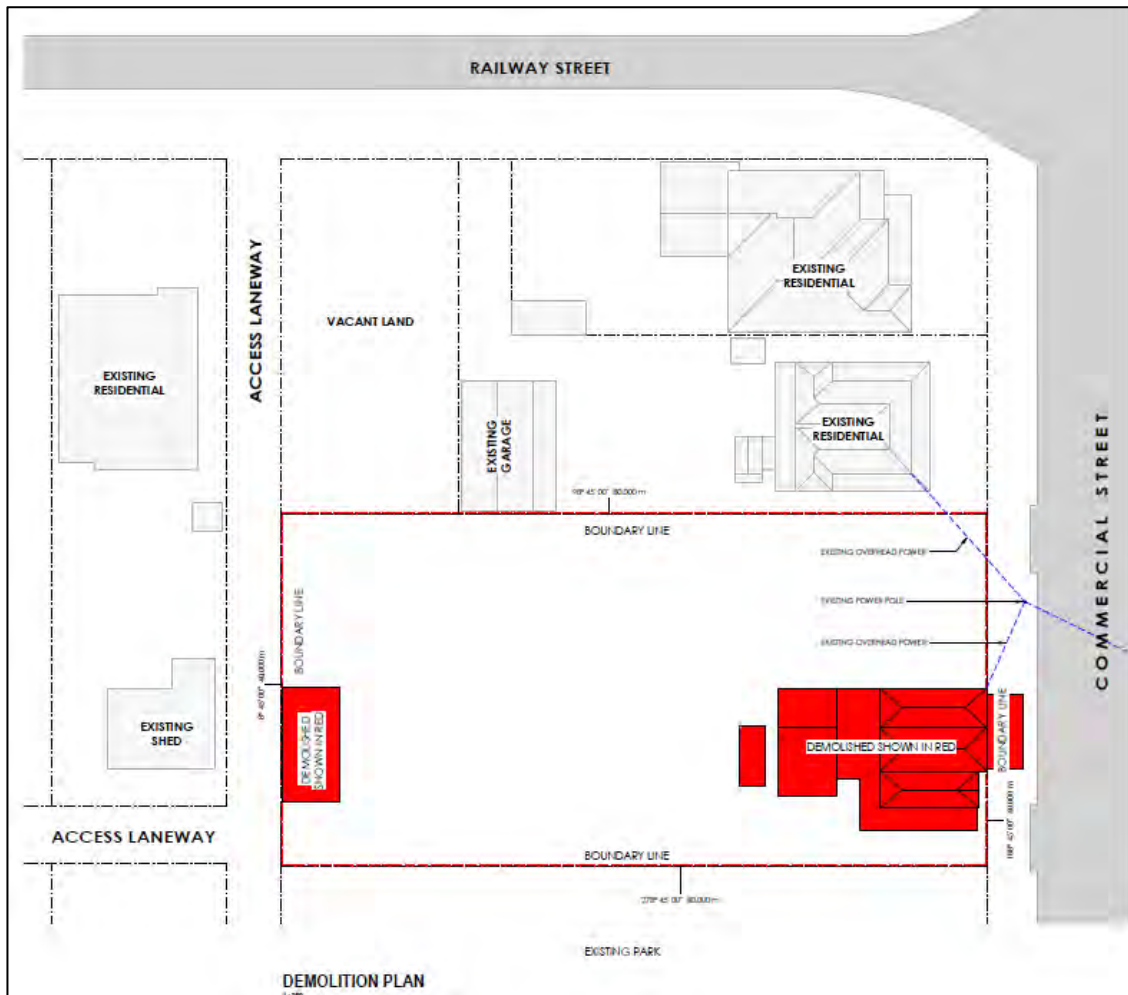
The plan showing the proposed structures to be demolished by the Applicant
